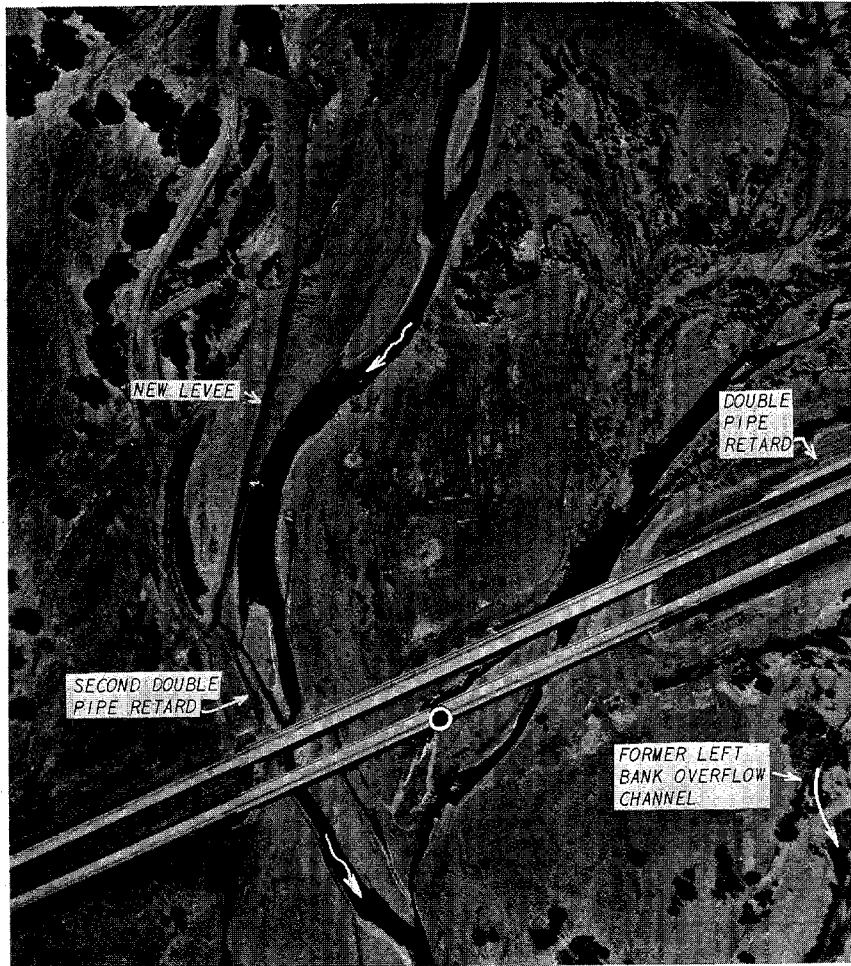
Aerial view of Stony Creek bridge showing extension of right-bank levee in 1970. (From Calif. Dept. of Transportation.)
